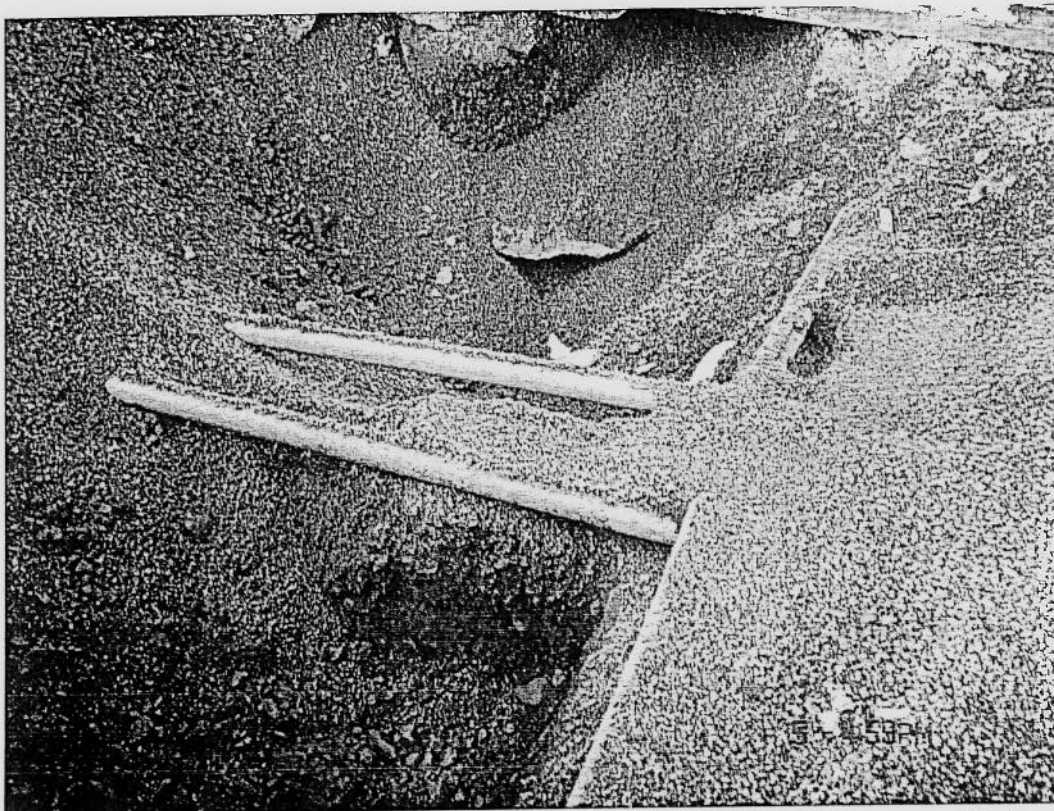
View North-Northwest of piping from gasoline tanks into area between dispensers. No evidence of contamination along piping.
